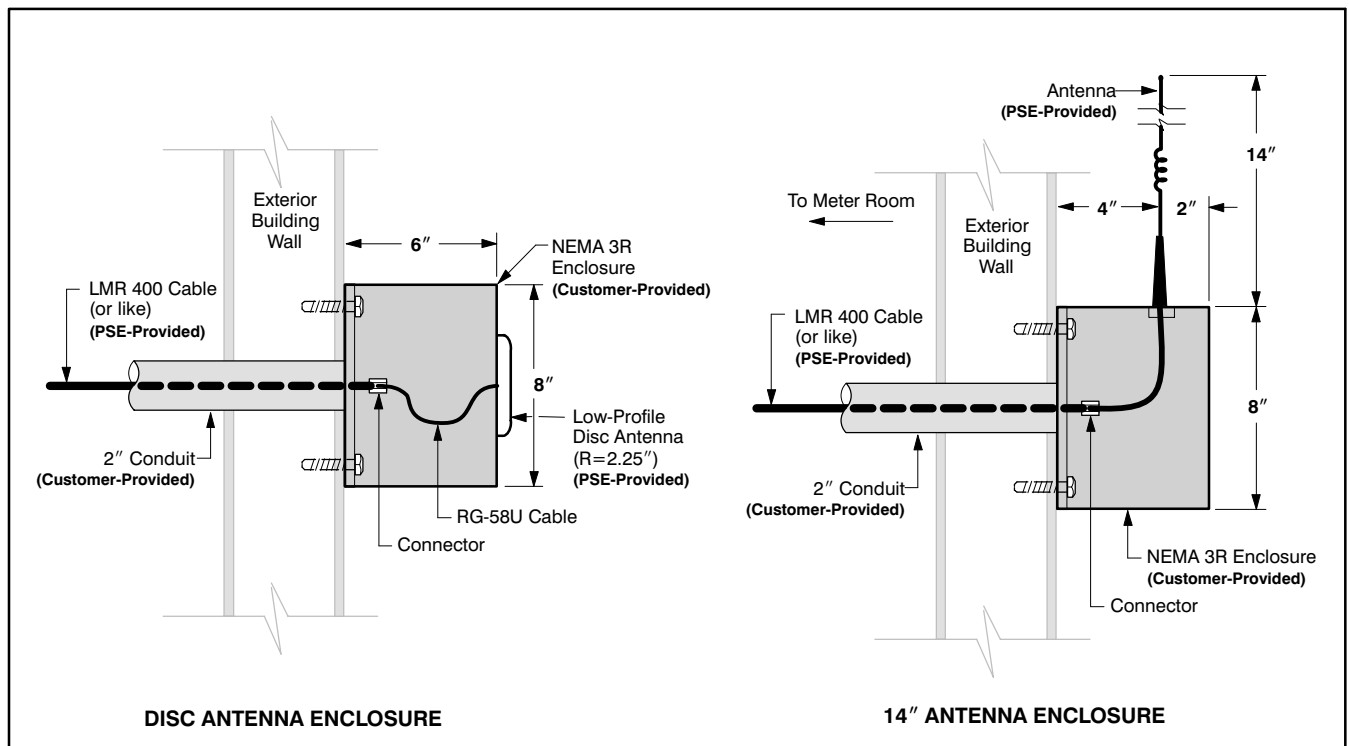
Typical 8 in. x 8 in. x 6 in. exterior wall-mounted AMR antenna installations
